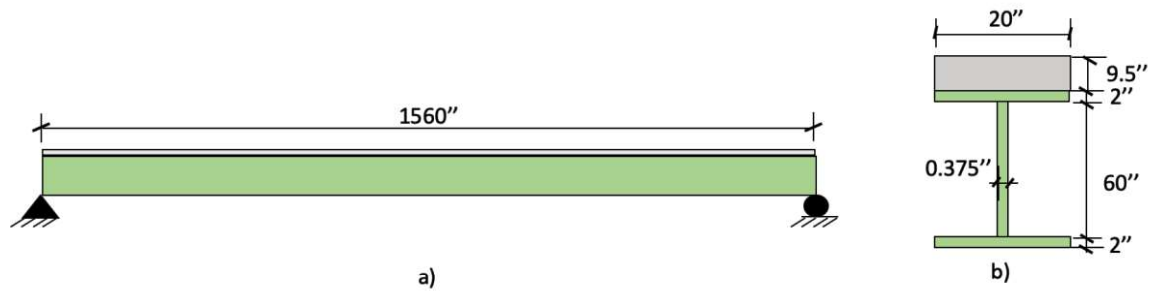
Simply supported composite beam a) side view of the beam; b) beam cross section
